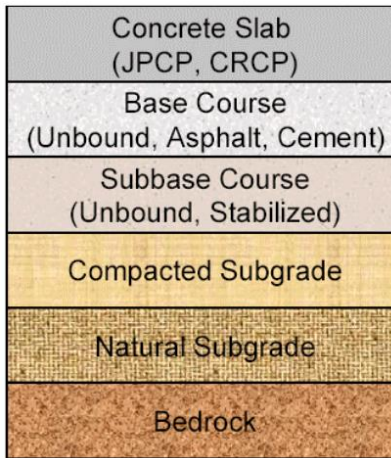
Rigid pavement profile (adapted from NCHRP 1-37A Design Guide, 2002)
